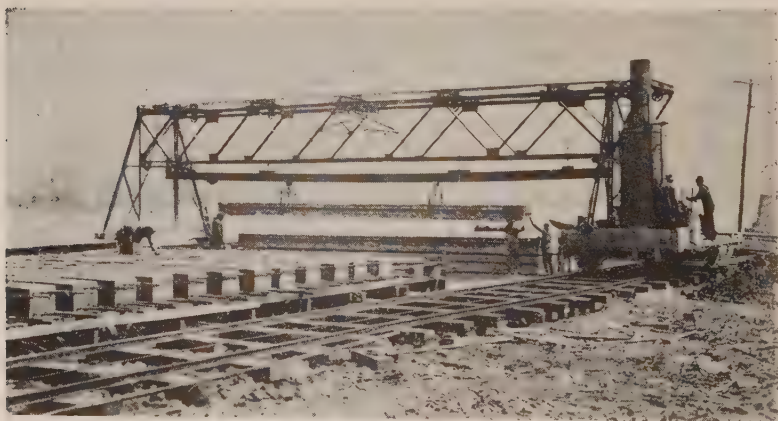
CASTING YARD FOR CONCRETE PILES.
